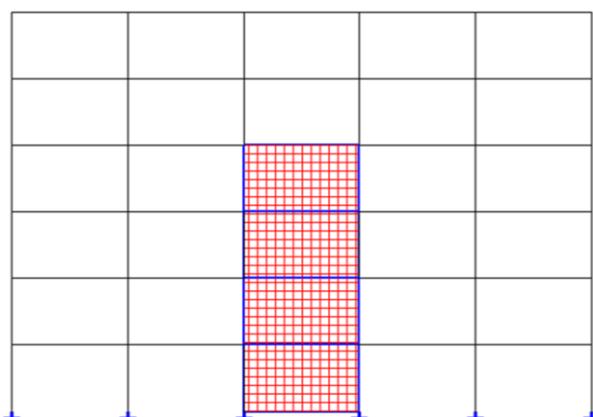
Model 10 – Shear Wall up to 4th Floor
